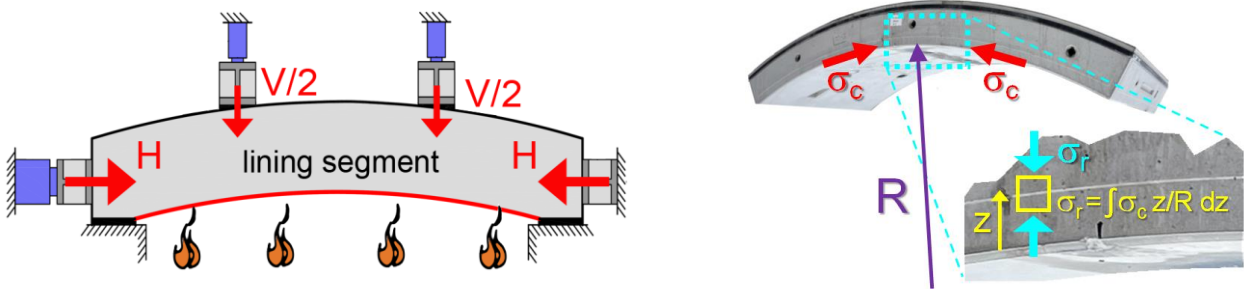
Arched segment load scheme and ensuing radial stabilizing stress.
